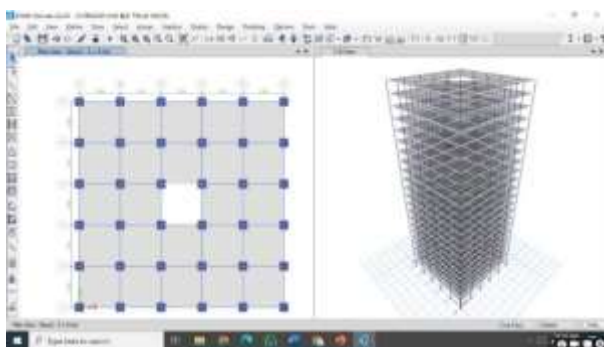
Plan and 3D View of Outrigger and Belt Truss Model in ETABS
